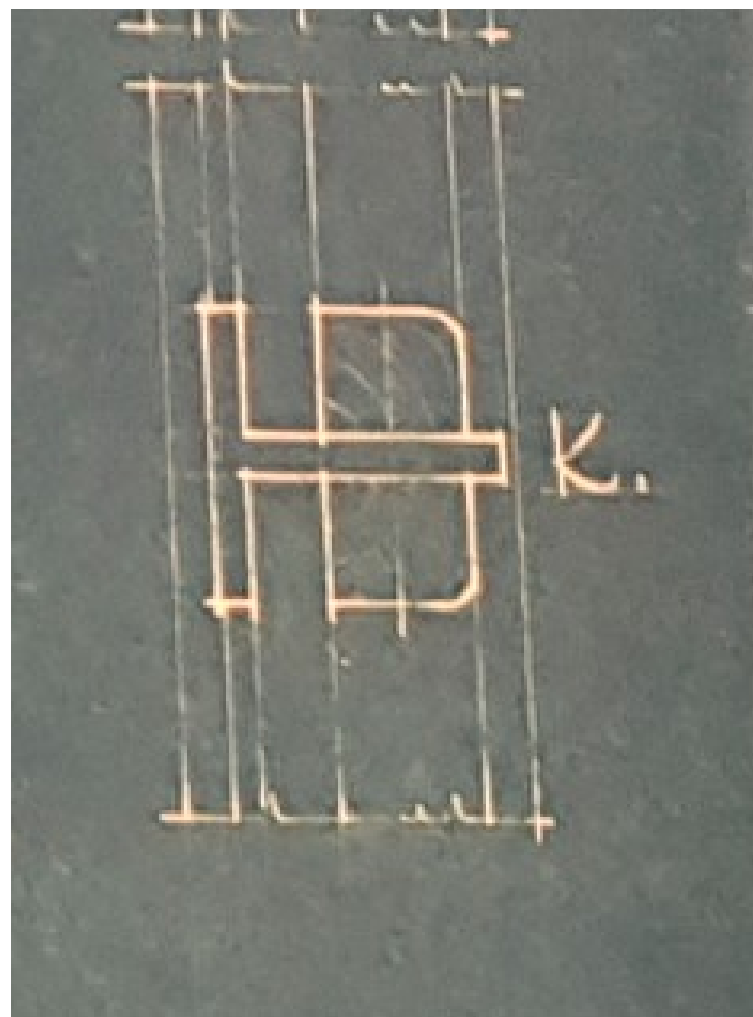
Extract of original windows drawings, showing Section K - glazing bar - with flat external profile.
